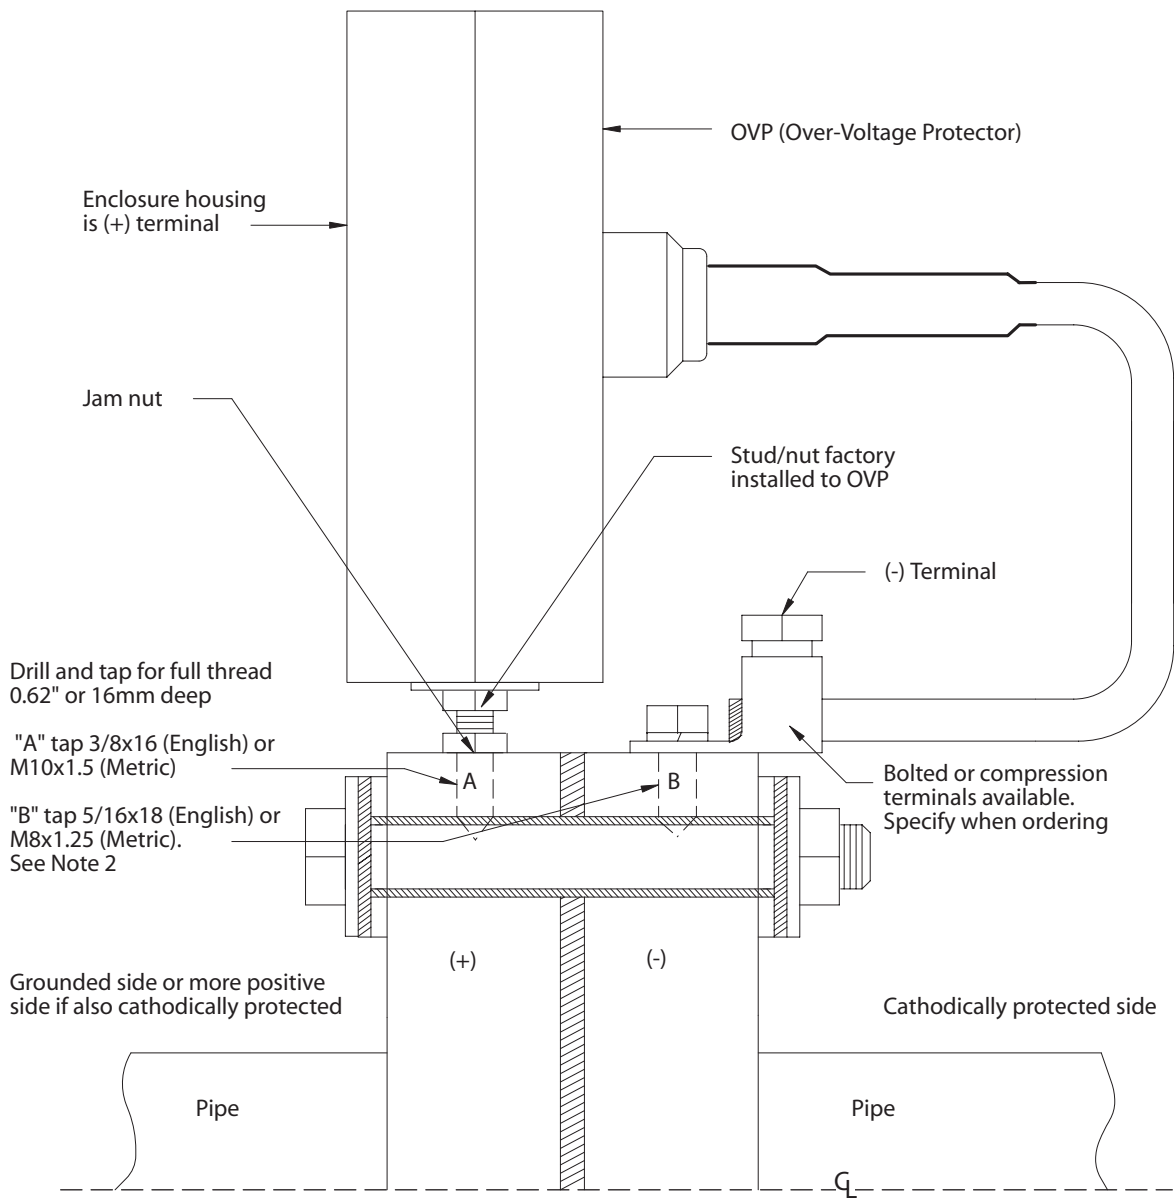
Insulated Joint Application – Flange Mount Using Tapped Holes with FMTH Mounting Kit
